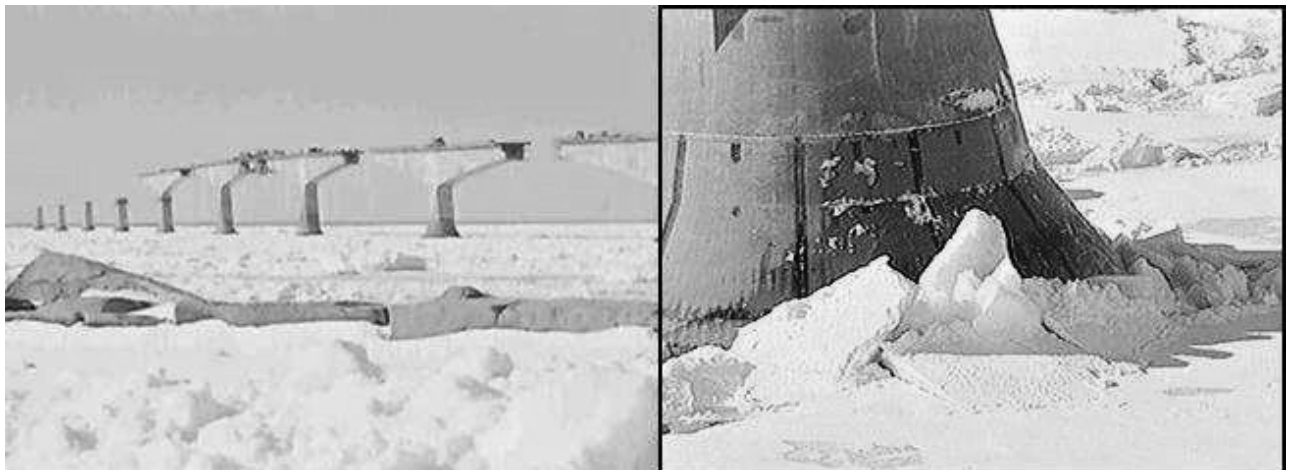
Prince Edward Island bridge - Canada; Ice load on the piers reduced by conic shape
